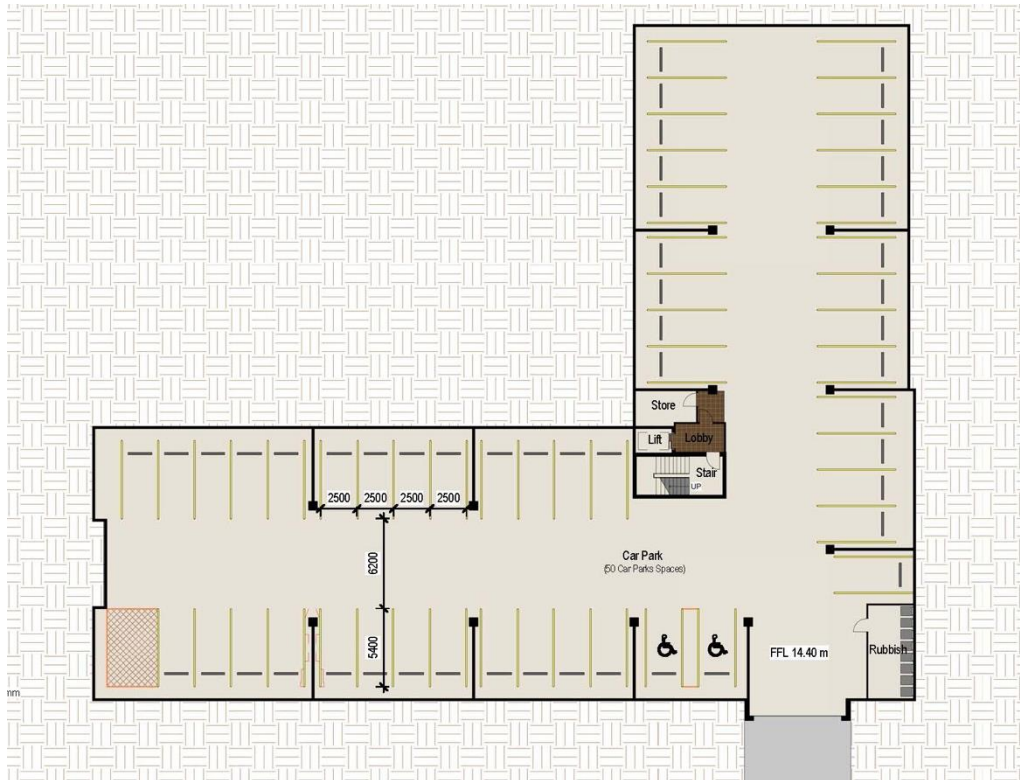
The Level 0 (basement) floor plan of Building B03 (Ryman Drawing A1-010 RC20).
